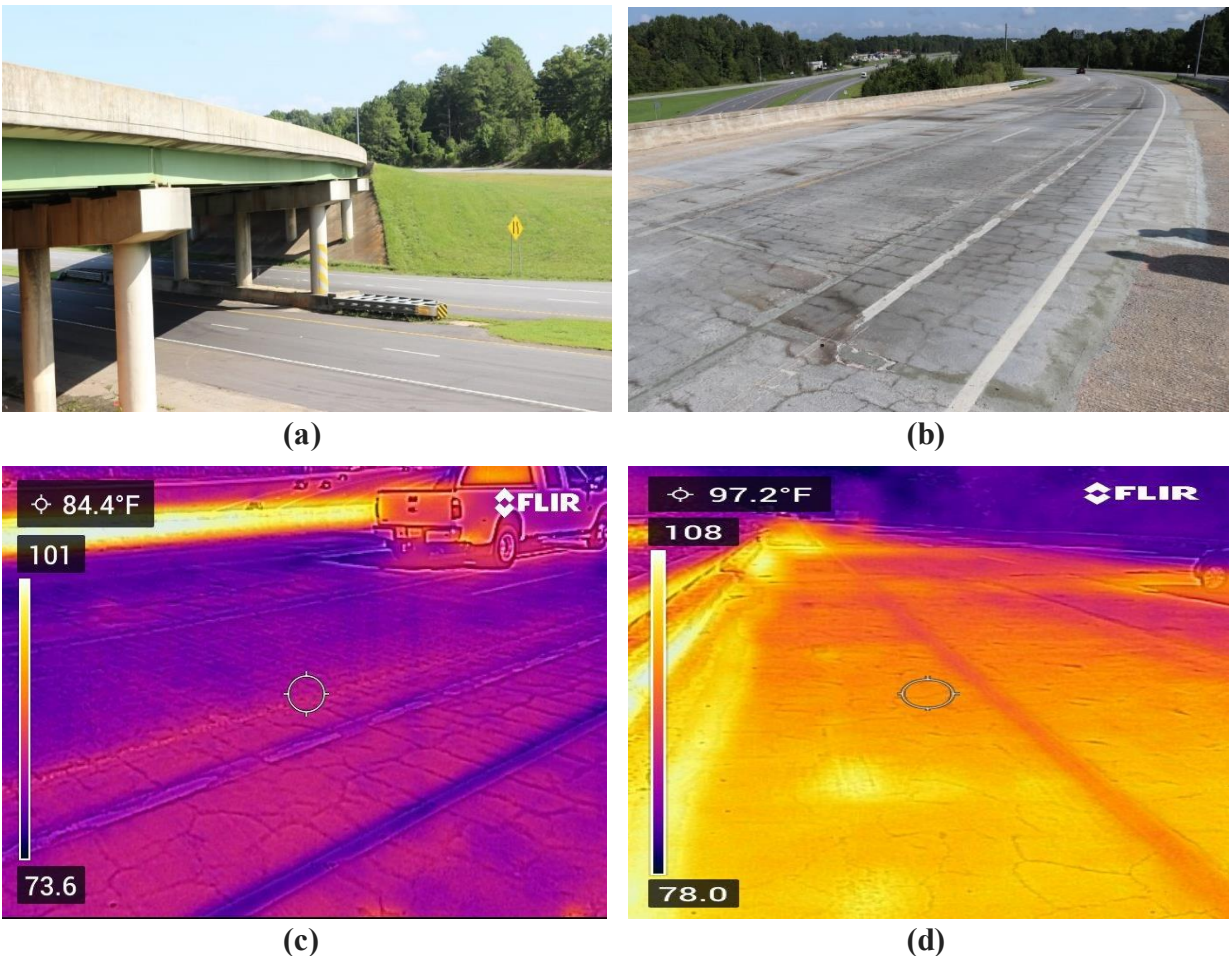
(a) Bridge Substructure and Supports (b) Bridge Pavement Surface with Alligator Cracking (c) Thermal Gradient of Pavement Surface in the Morning (d) Thermal Gradient of Pavement Surface in the Evening
